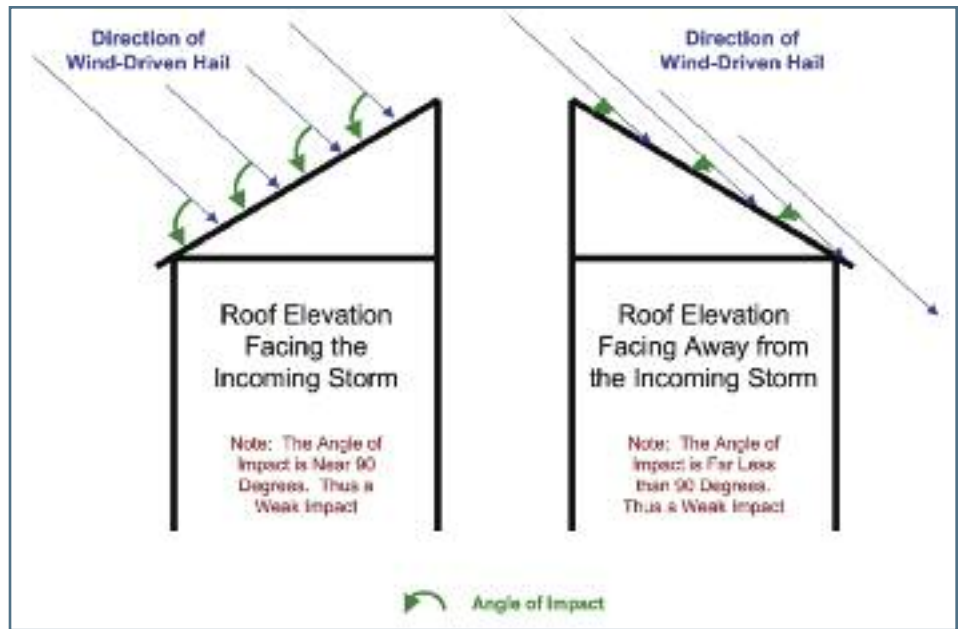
Hail impact on roof facing incoming storm and roof facing away from incoming storm.
